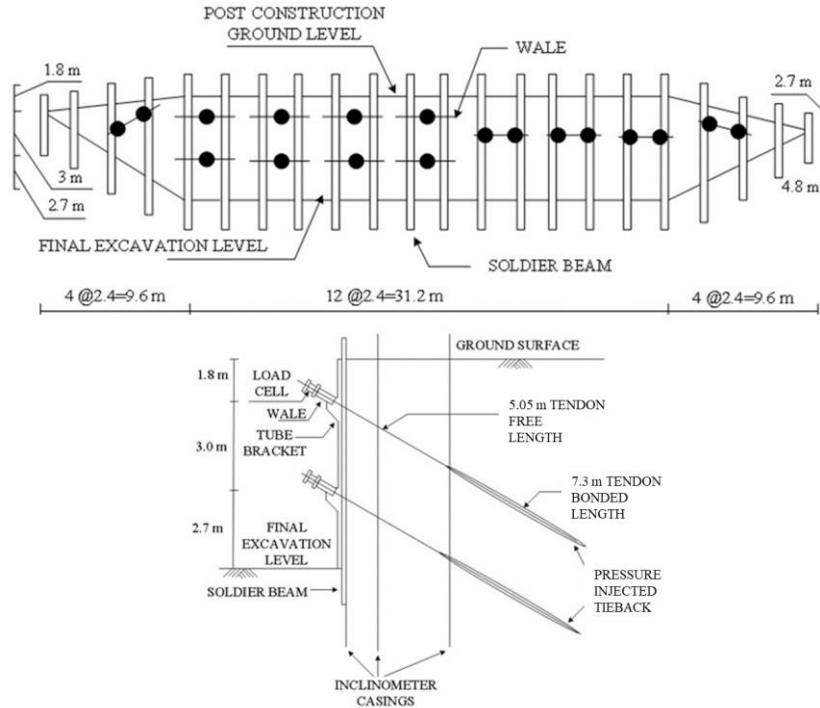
Tieback soldier pile and lagging wall (Chung, Briaud, 1992).
